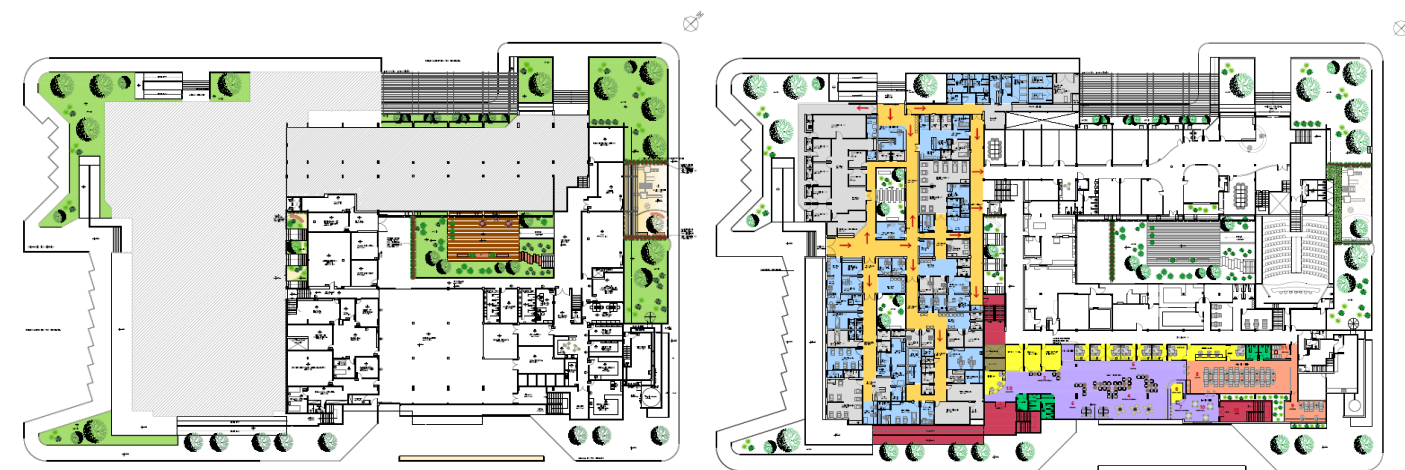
(a) Floor plan of ground level and (b) and floor plan of the first level of HemoCE blood center.
